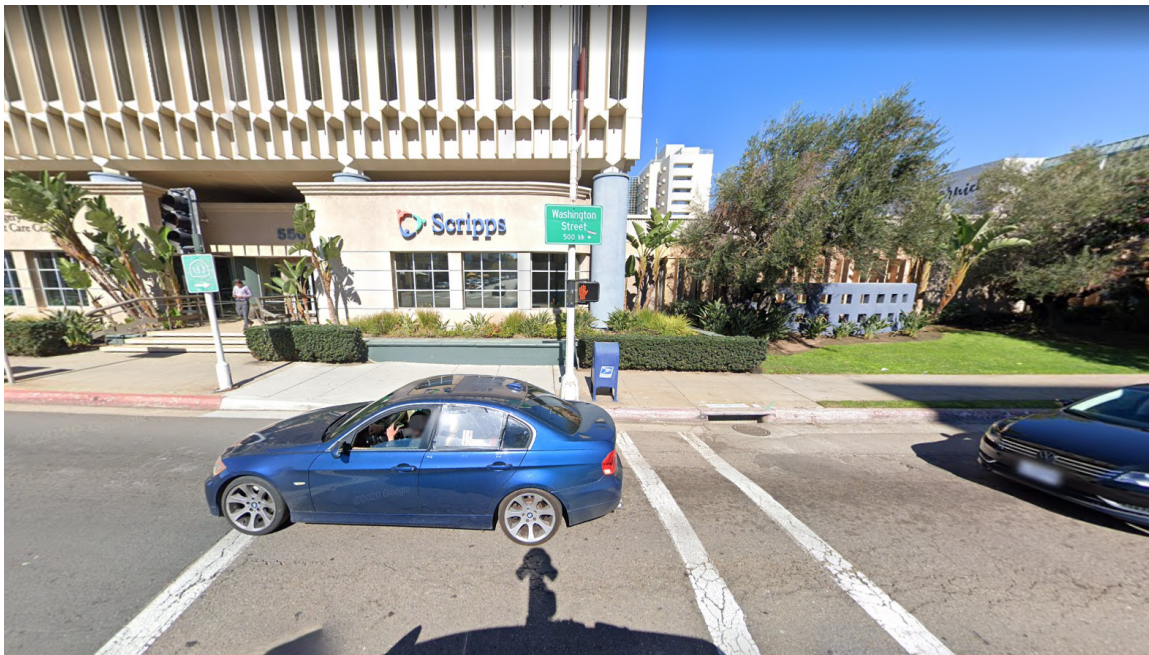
Site Photo – catch basin on north side of Washington Street
